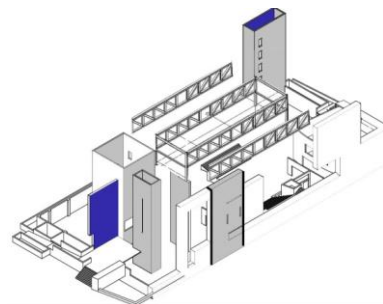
Southwest axonometric highlighting shear wall locations in grey, possible shear wall locations in blue, and trusses. Modified by N. Trujillo. (Courtesy of Jon Anderson Architect)
